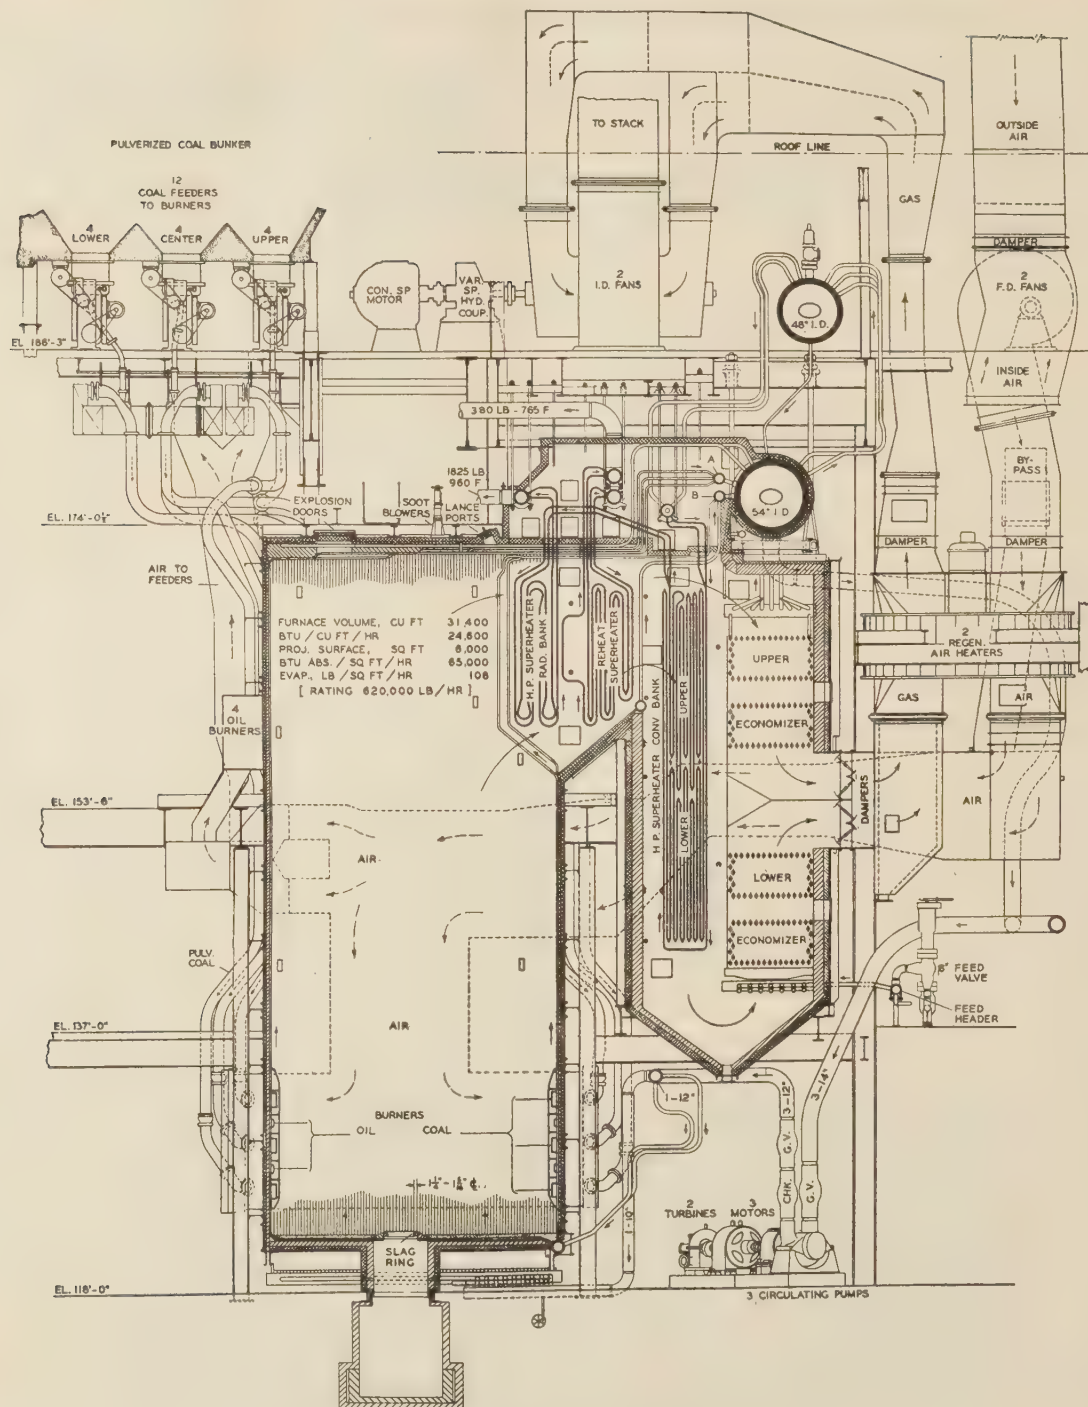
SECTIONAL ELEVATION OF NEW BOILER UNIT
